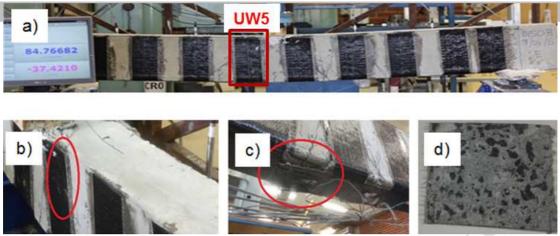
(a) Failure mode of Beam B150B; (b) U-jacket debonding; (c) Rupture of the soffit strip; (d) BFRP/Concrete interfacial failure of U-jacket UW5
